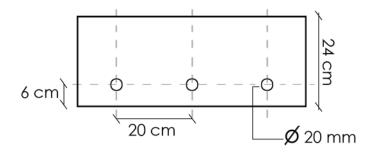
Thermo-active ceiling cross section showing plastic pipes embedded 6 cm into concrete
